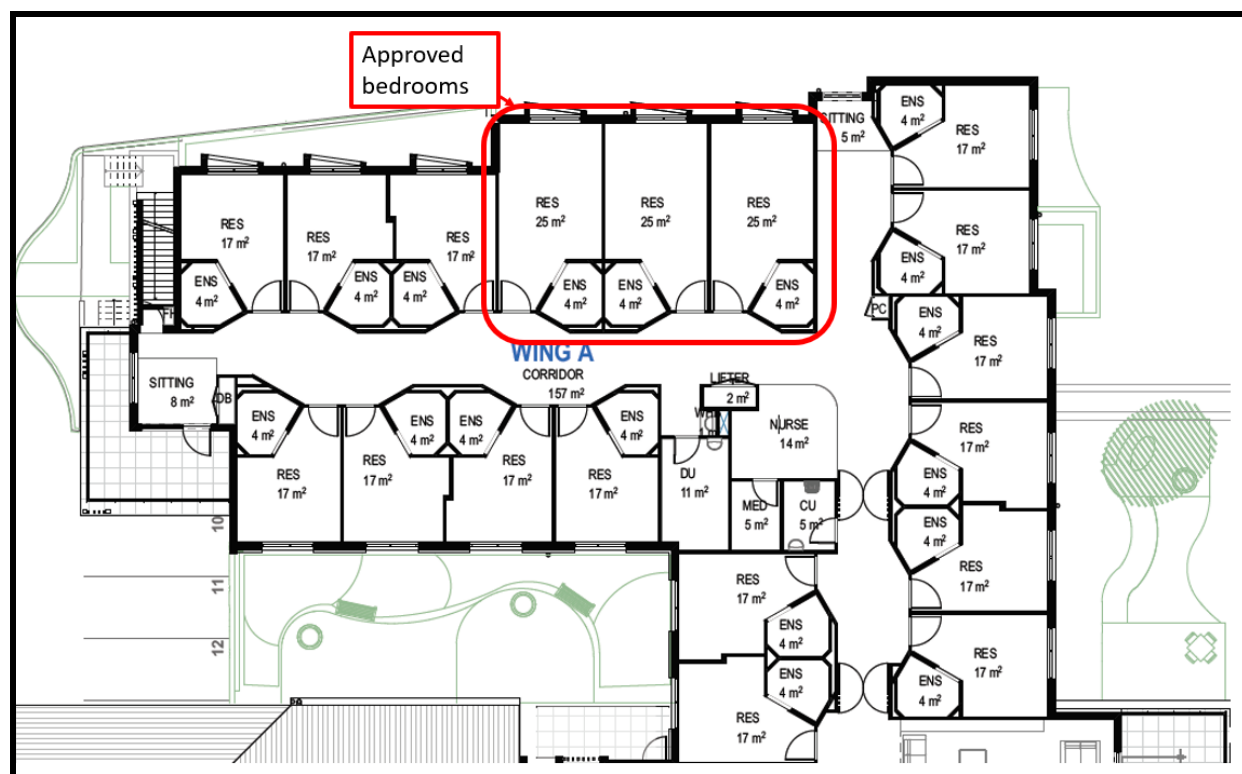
Approved first floor level Wing A (Source: Calder Flower)
